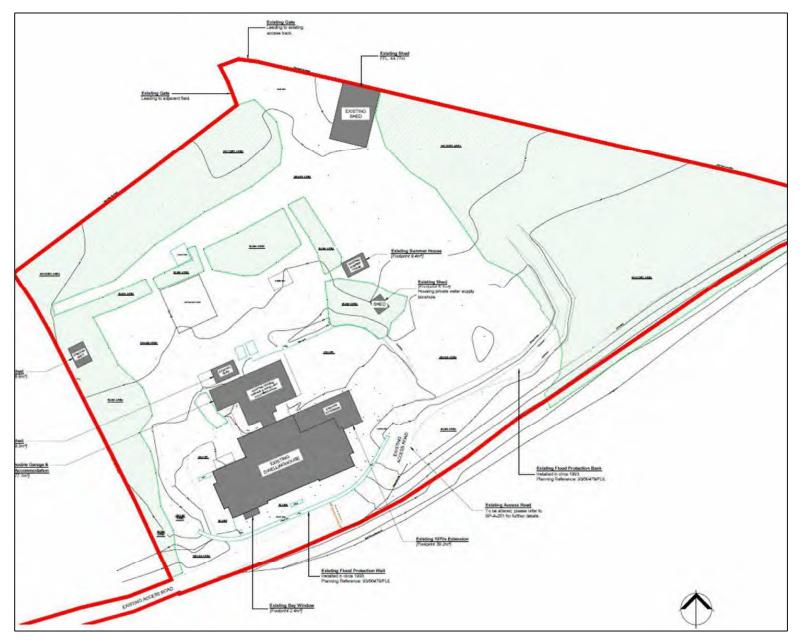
Existing layout (excerpt from Drawing BOM-SAB-DH-XX-SP-A-0100_P01- see Plans section of this report)
